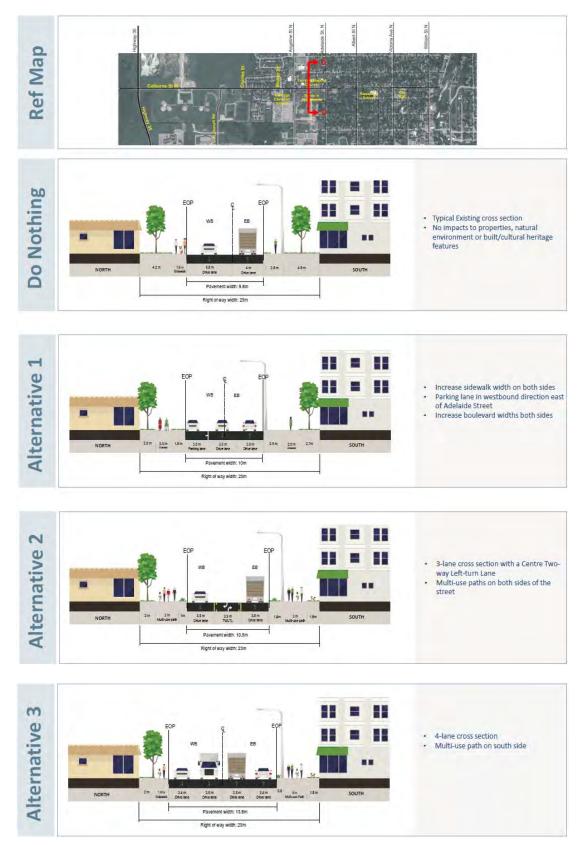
Segment D: Colborne Street – East of Angeline Street
